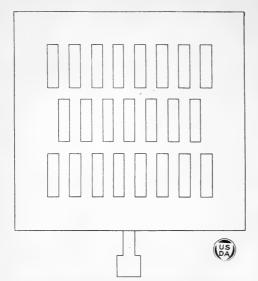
Square plan of ranch, showing location of watch tower and the alternate arrangement of
